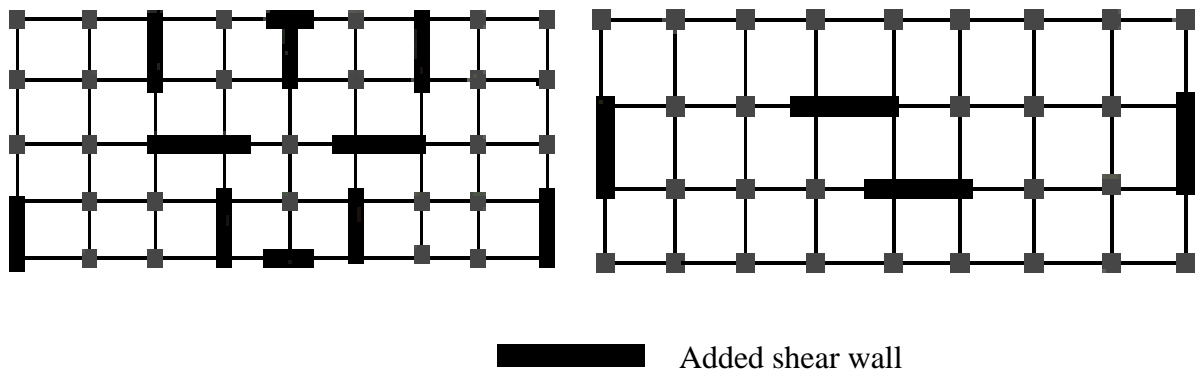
14 Convenient distribution of added shear walls for long rectangular buildings ^[10]
